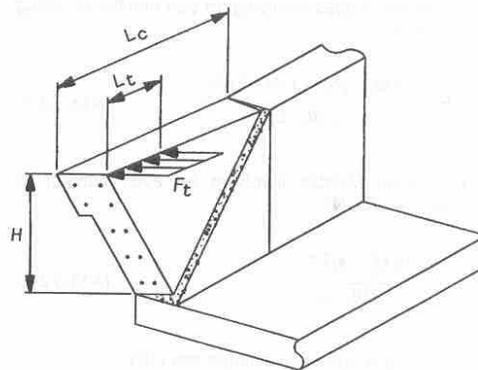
Yield Line Analysis of Concrete Parapet Walls for Impact Near End of Wall Segment
